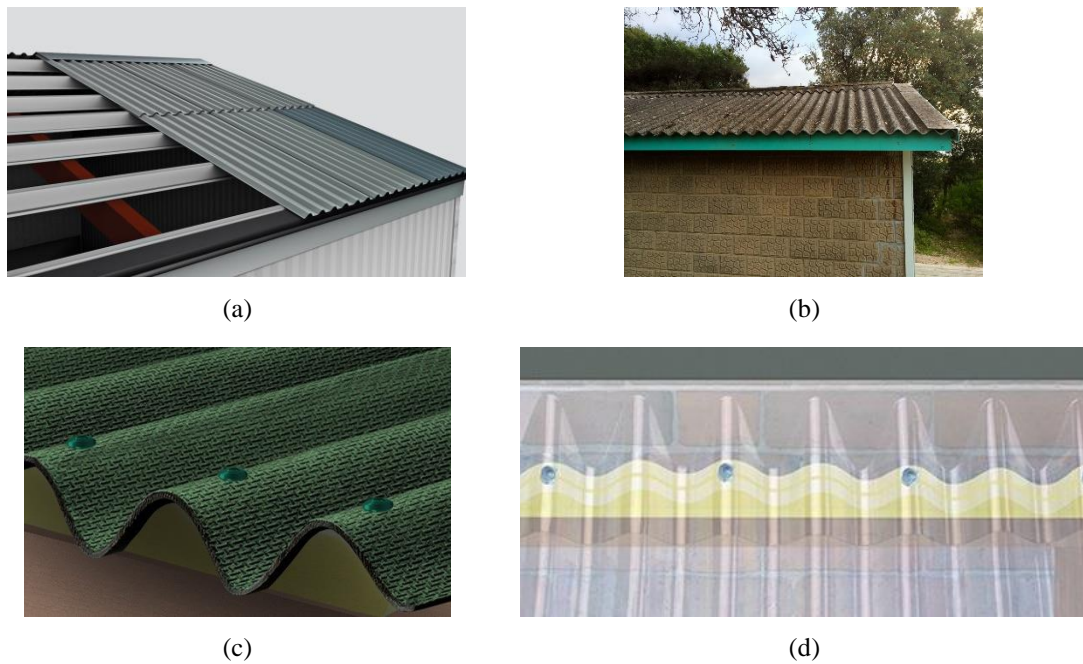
Different roofing material (a) steel corrugated roof over steel frame (b) Aesbestos roofing (c) bitumenous roofing sheet (d) PVC roofing sheet
